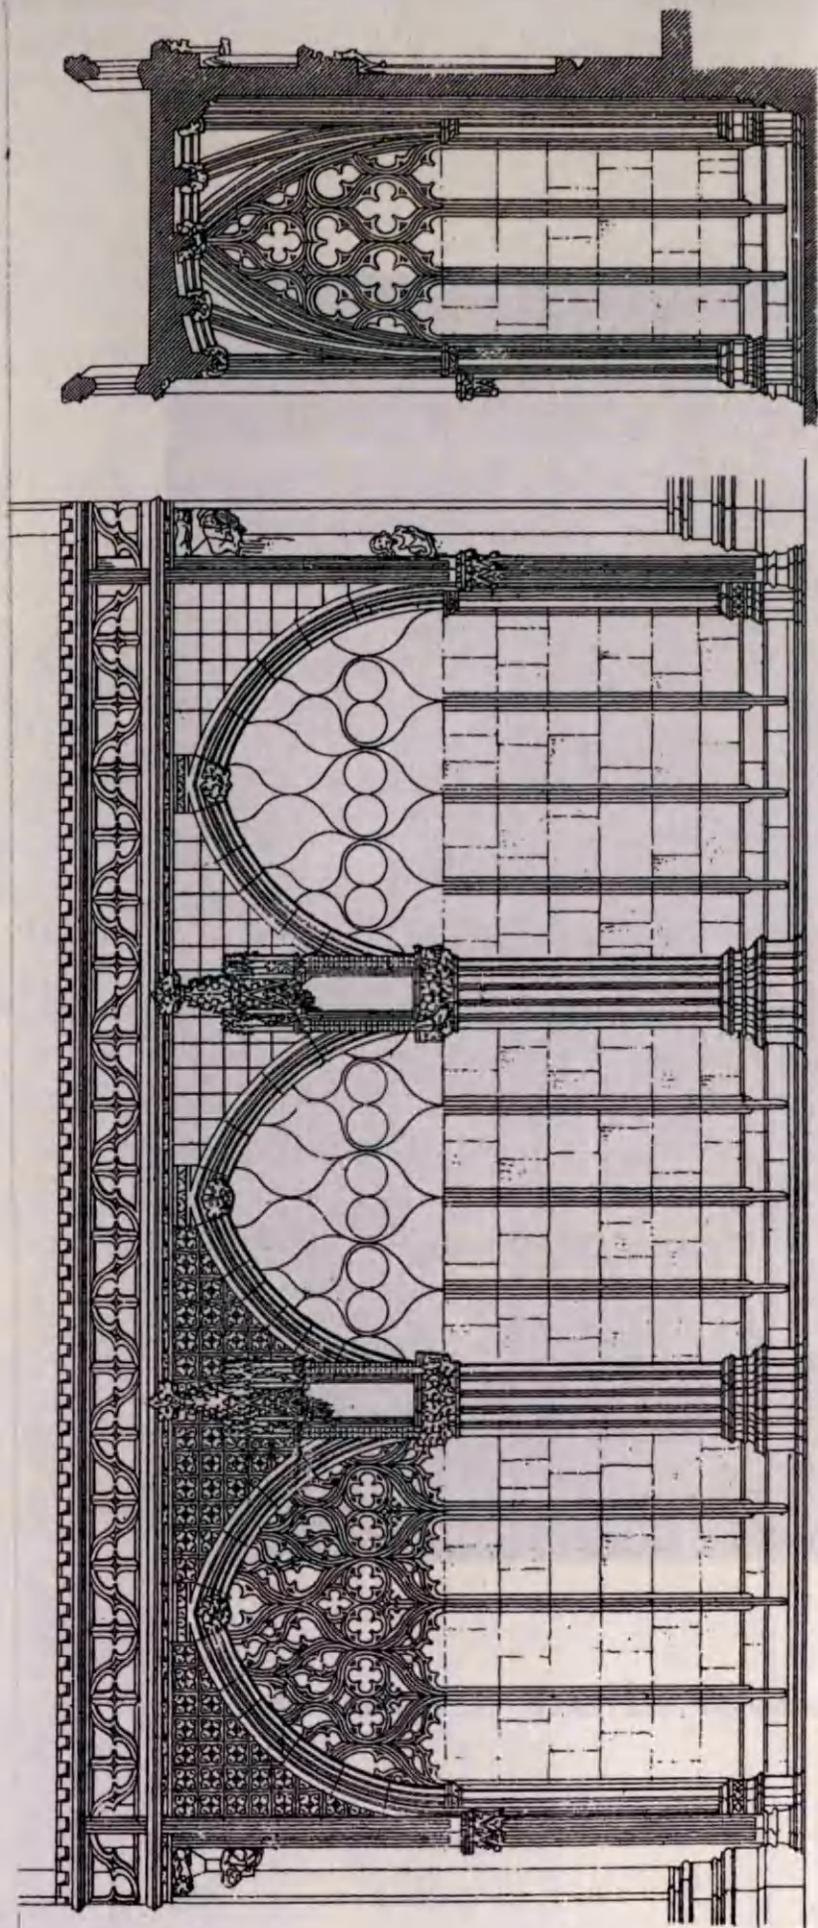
BEVERLEY MINSTER: reredos, plan section and east elevation.
